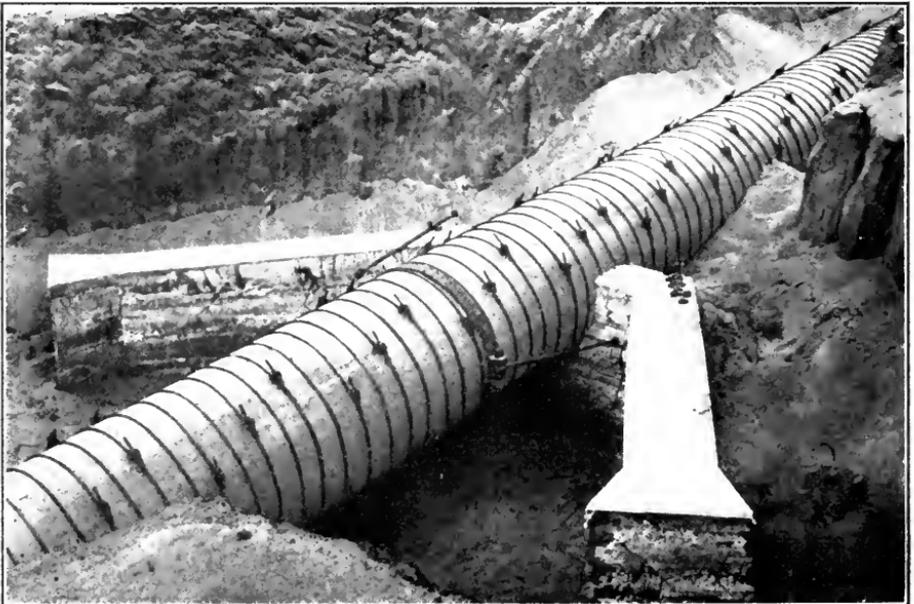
FIG. D.—Anchor on 42-inch pipe line. Tacoma, Wash. (Washington Pipe & Foundry Co.)
